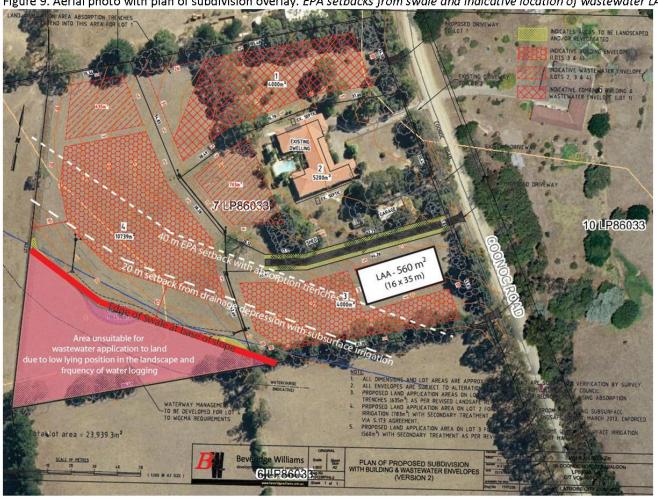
Aerial photo with plan of subdivision overlay. EPA setbacks from swale and indicative location of wastewater LAA.
